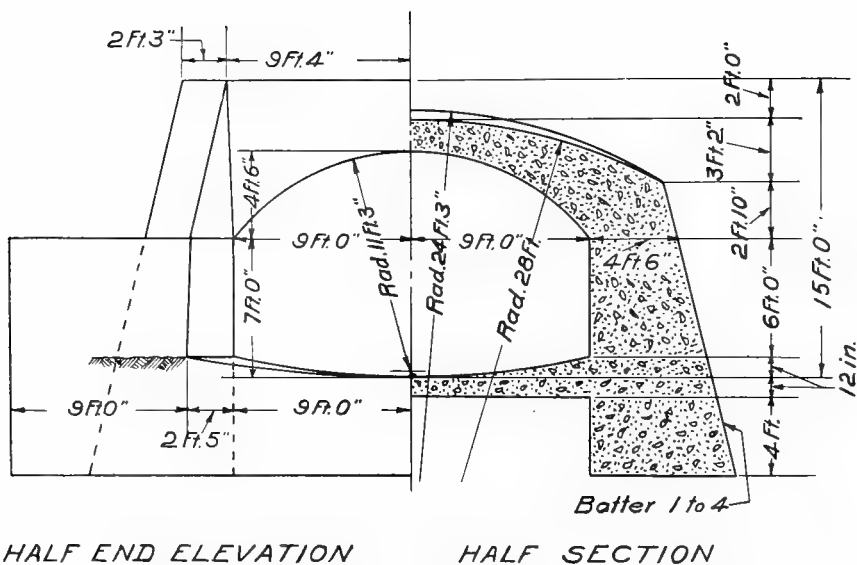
CROSS SECTION OF 18-FT. CULVERT, BANGOR & AROOSTOOK R. R.
